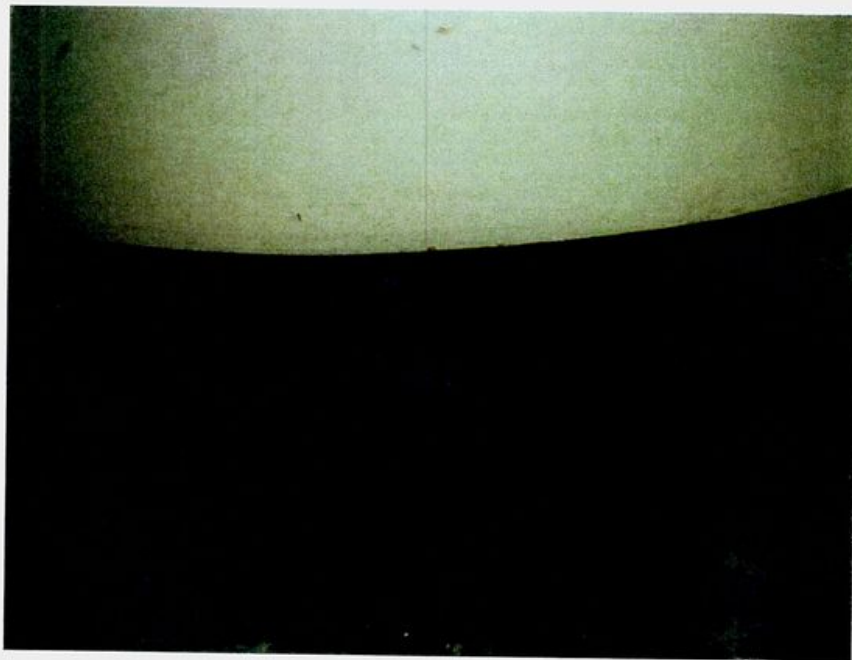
Garage to stair wall – 300 core through unreinforced topping and original slab
